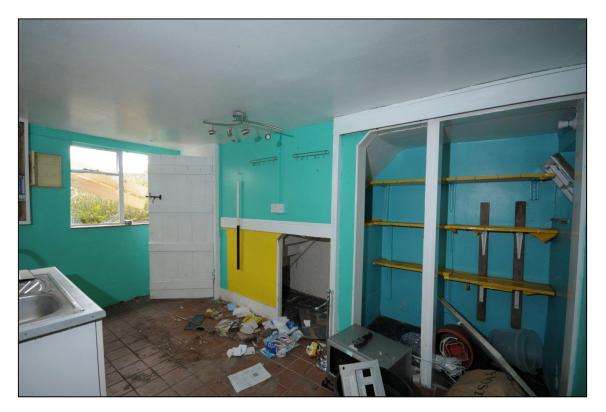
No. 43, kitchen, looking south-east (Scale 1m)
